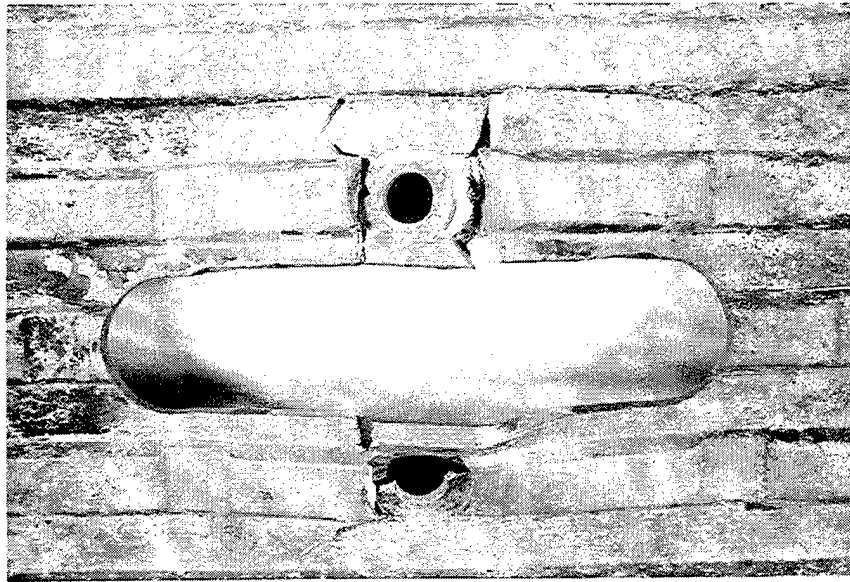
Same close-up view of the damaged oblong hole in Figure 67 after the removal of the lifting bar, bolts, and steel ring.
